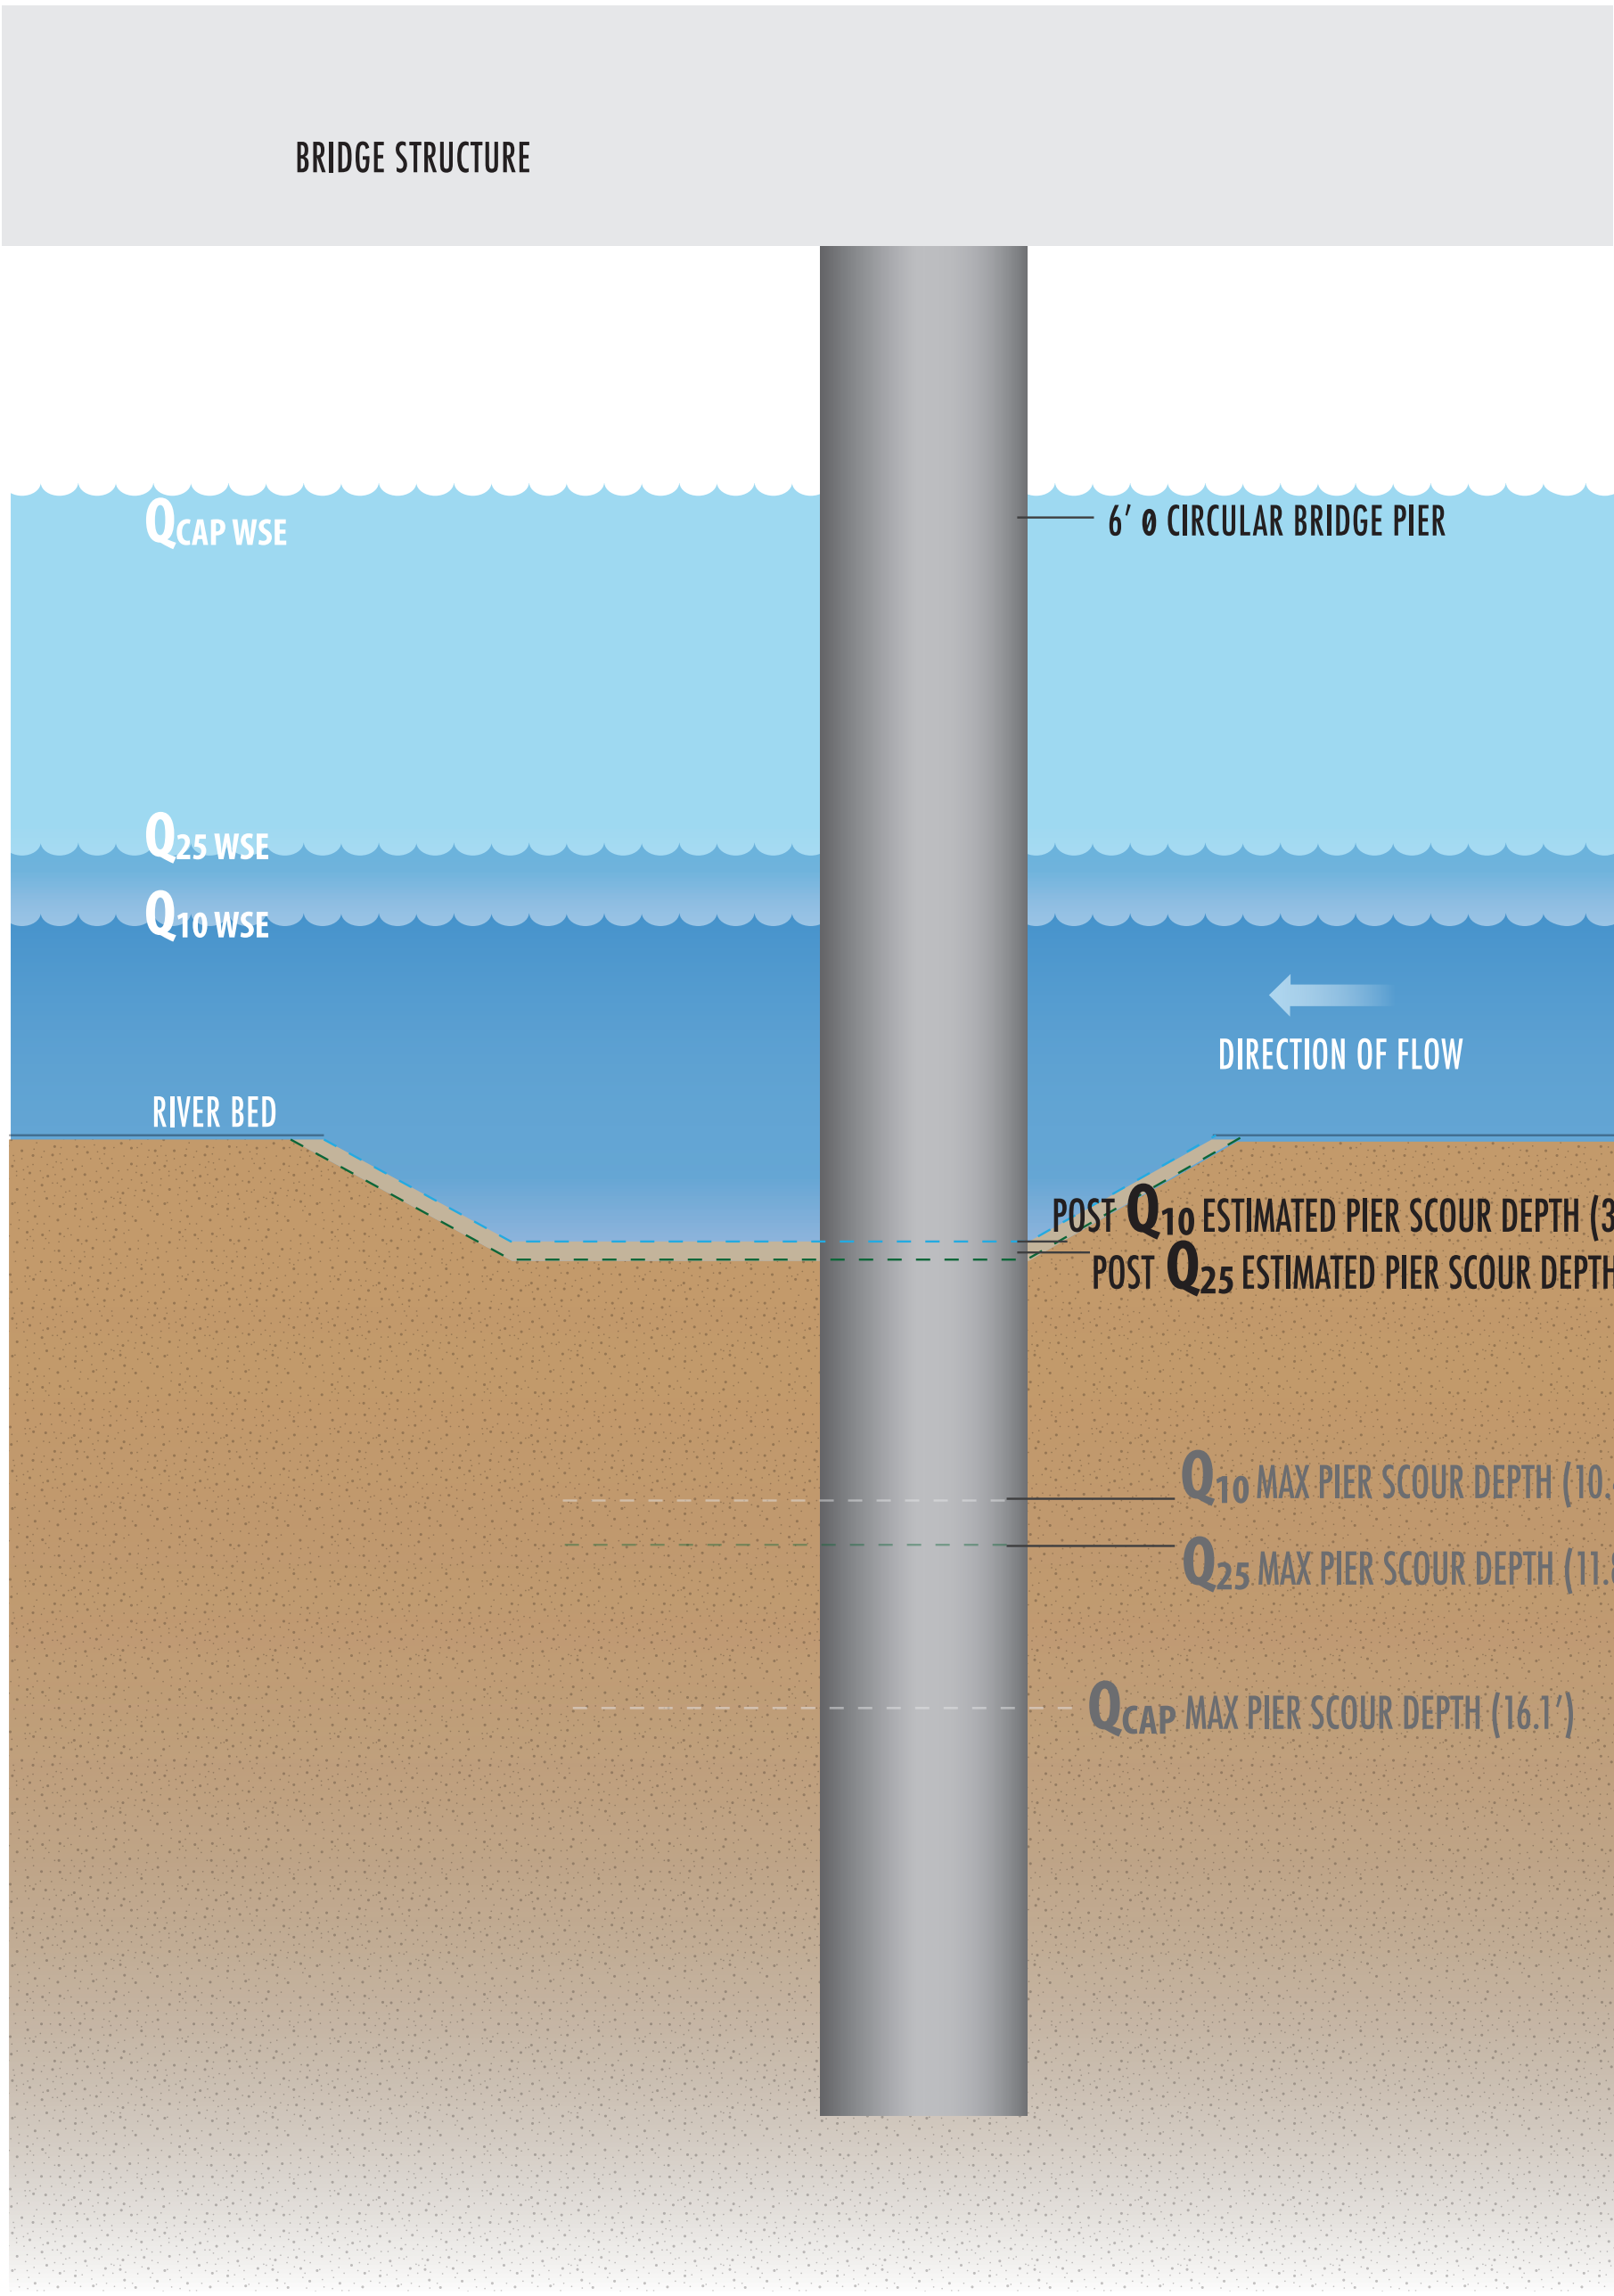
CROSS SECTIONAL VIEW OF PIER SCOUR AT LONG CANYON ROAD BRIDGE
